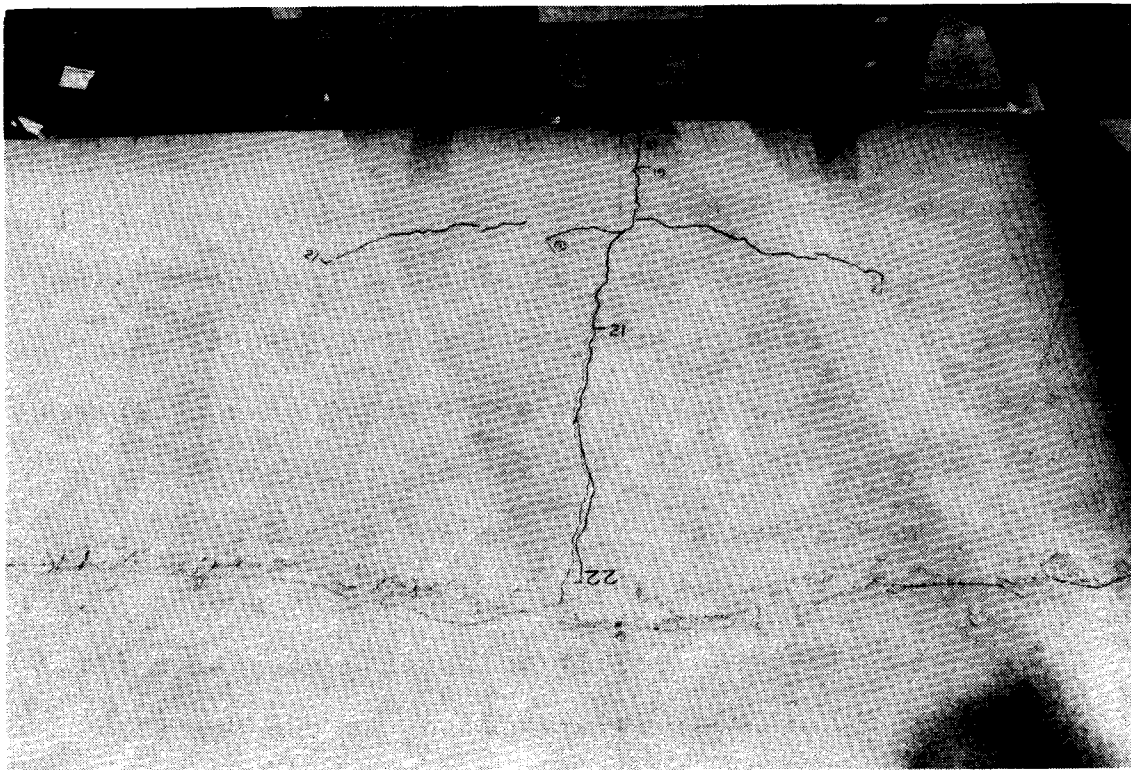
Transverse crack at north end of slab - truss 2
